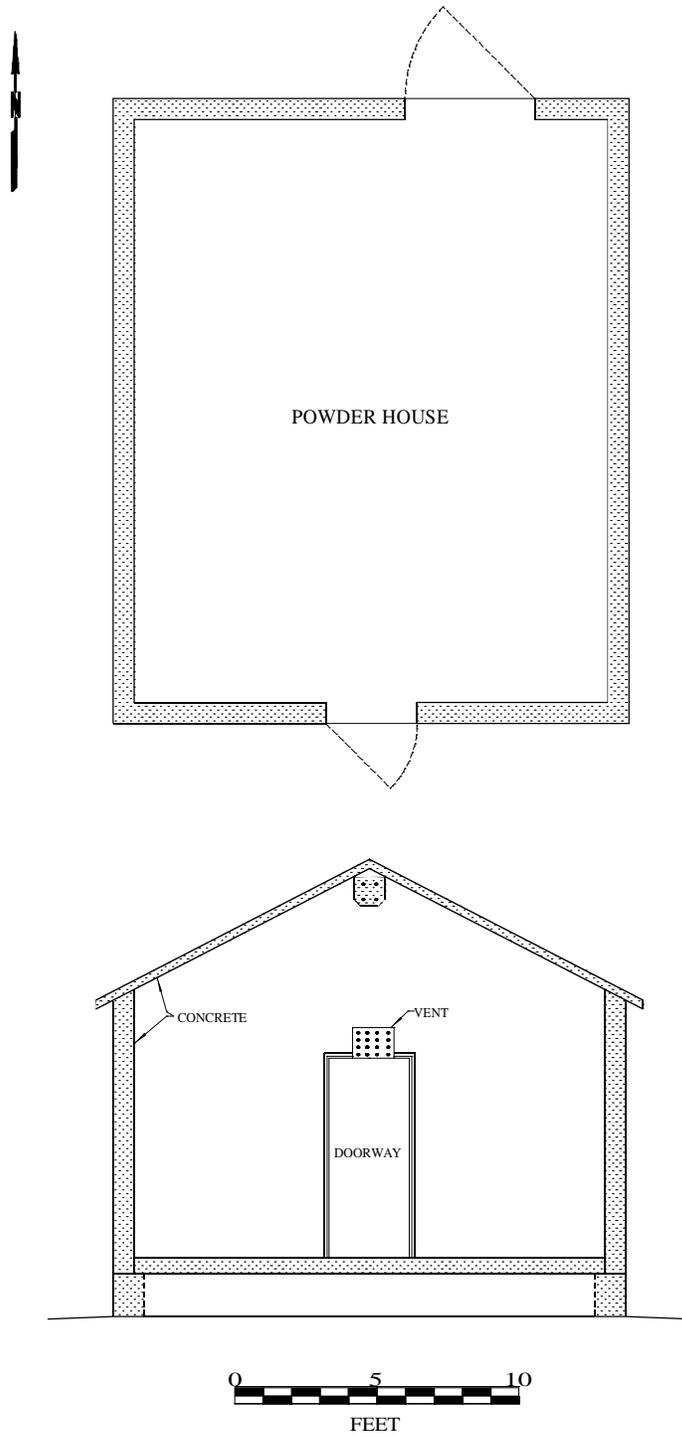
Plan and sectional views of the powder house (FRR 2002).
